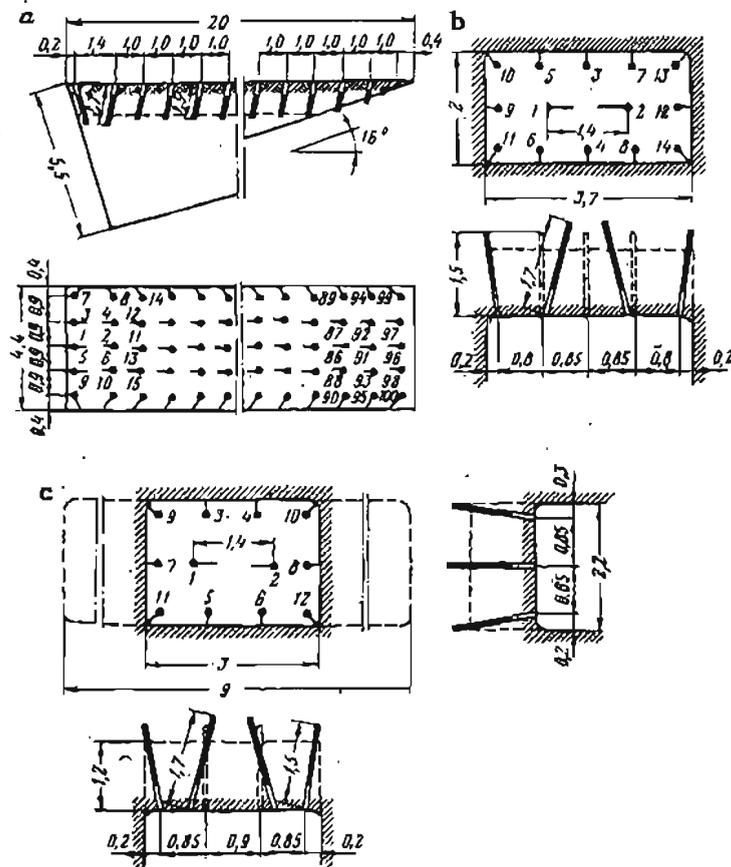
Blast design for a decline; a -first lift for a dipping trench; b -wide cross section; c -narrow cross section, (underground opening and loading point); all dimensions in m, (Emelianov et al, 1982)
